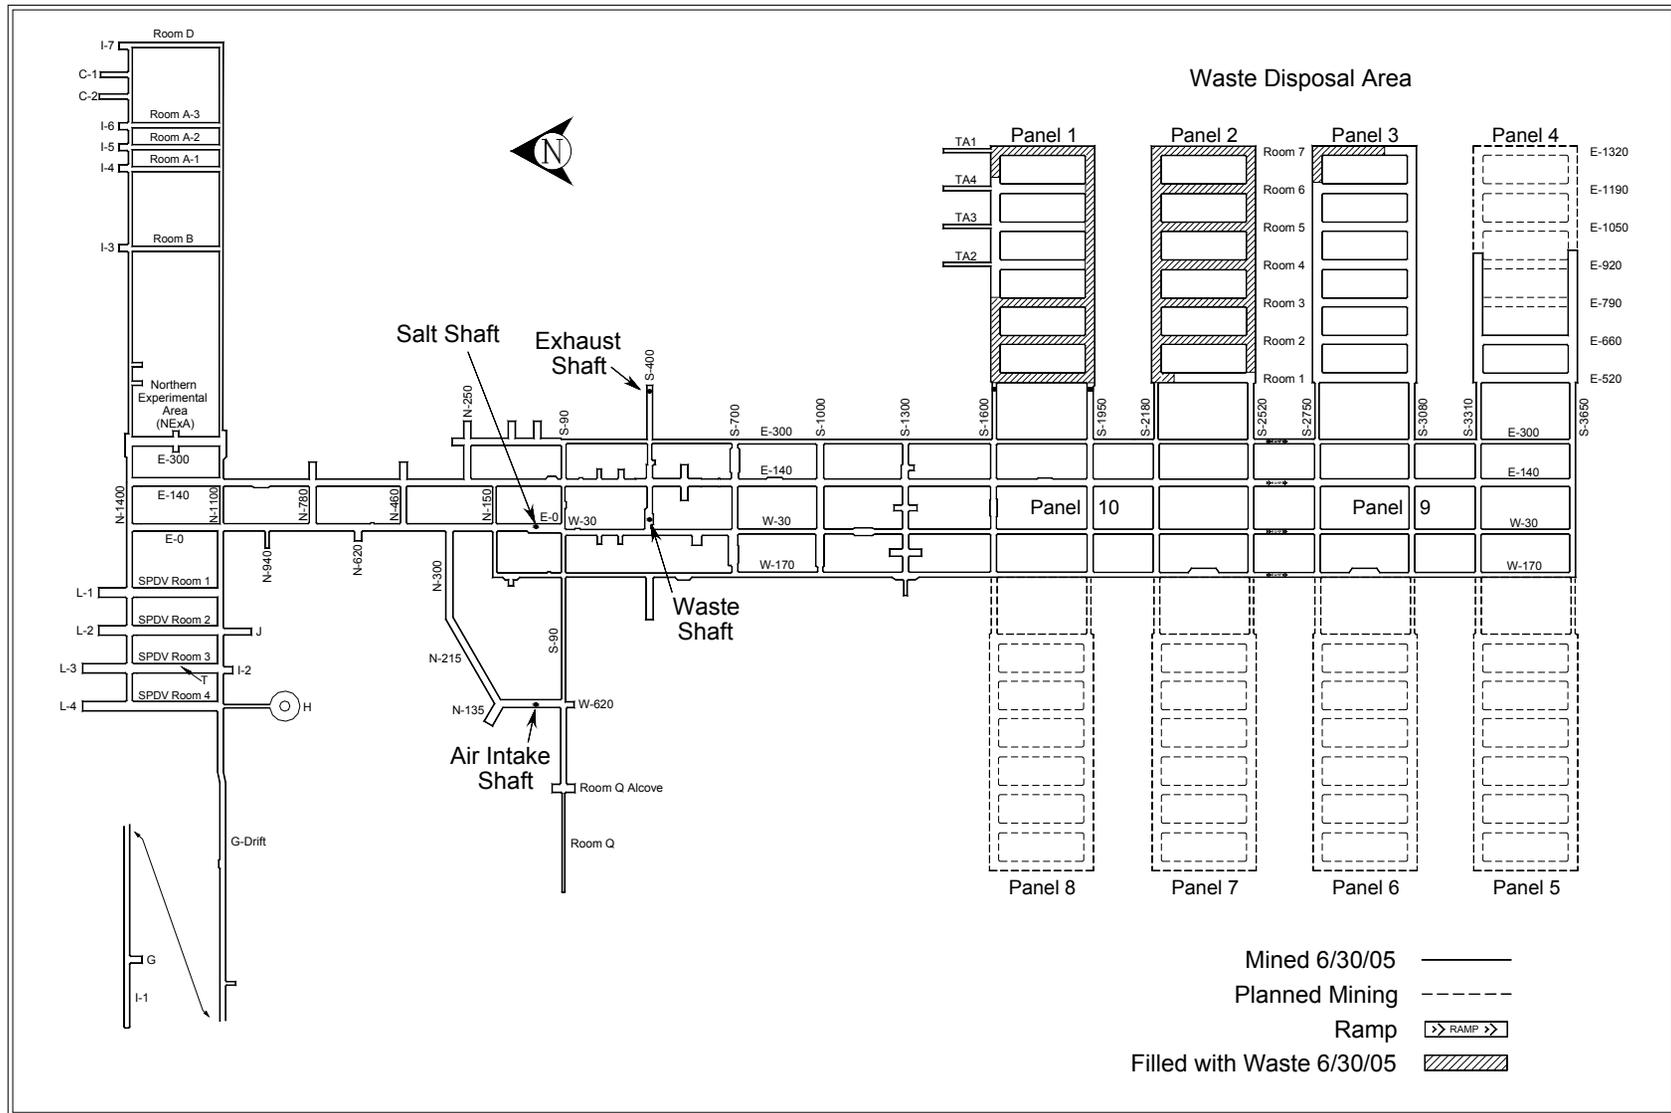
Underground Mining and Waste Disposal Configuration as of 6/30/05
